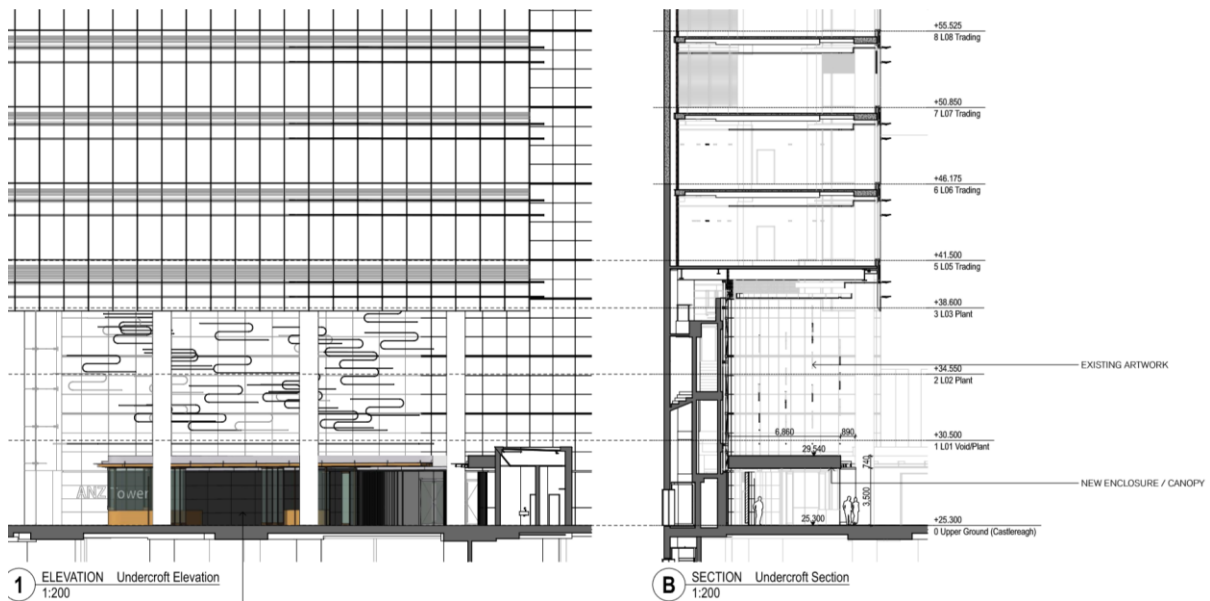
Elevation and section of the proposed pavilion to tenancy 10.
